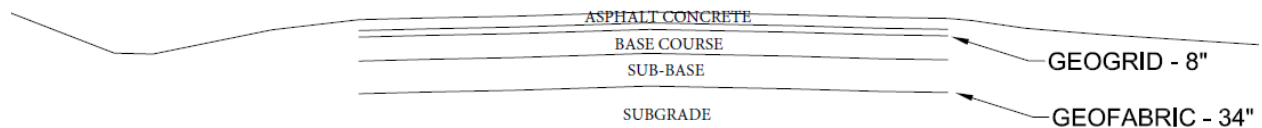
The as-built cross section of the test section FWD4-7. Horizontal scale is equal to vertical scale.
